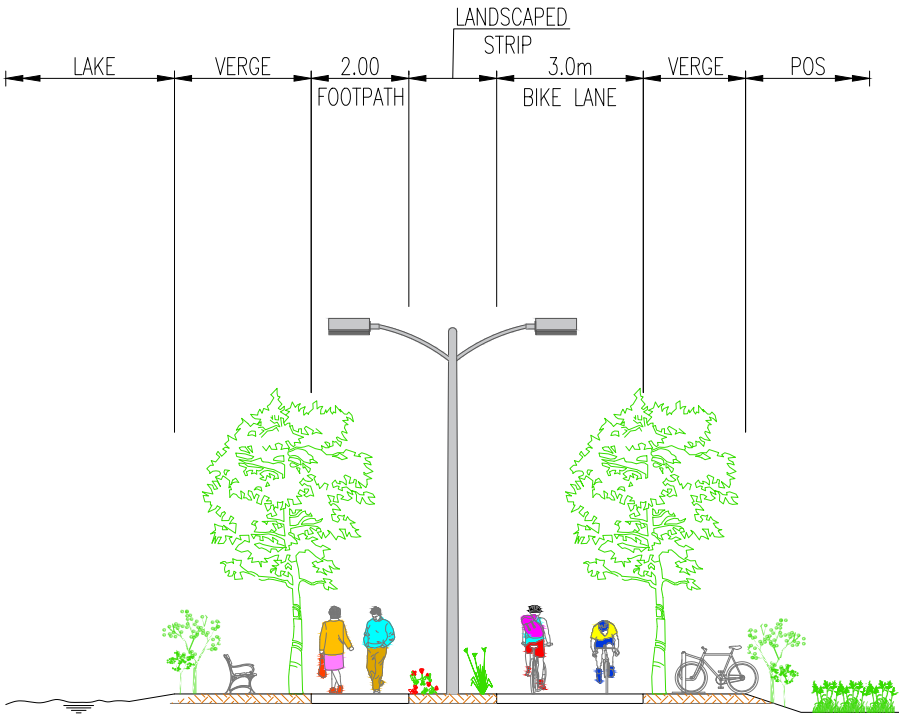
CROSS SECTION LINK ADJOINING A LAKE AND POS
